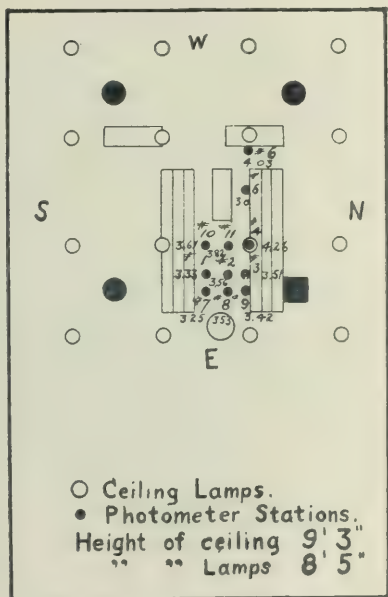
Section plan of basement, (china department), showing location of furniture, pillars, lighting units, test stations and illumination data.
